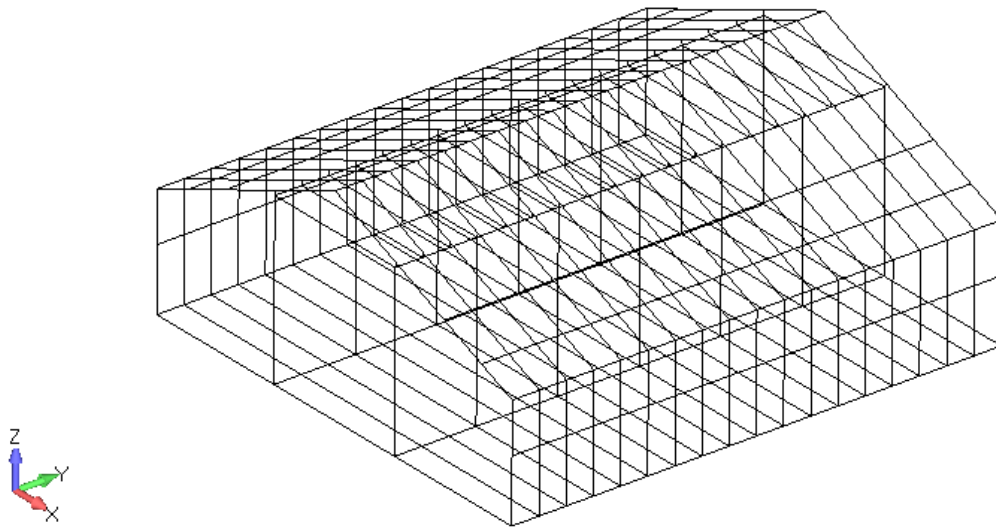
Finite element model of the building, posts spaced 1.875 m apart
